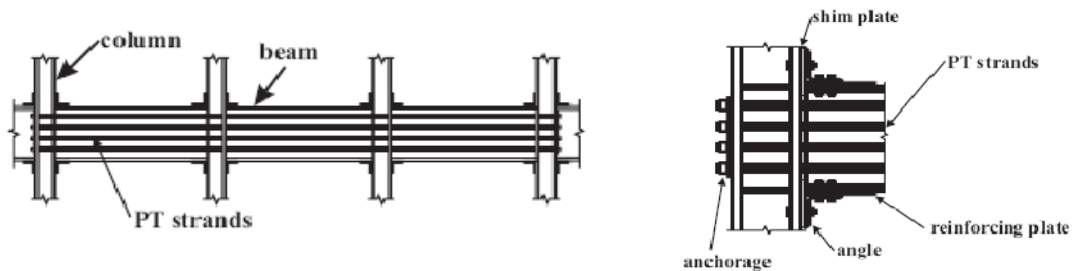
Hybrid Post Tensioned Connection for Steel Frames [10]
